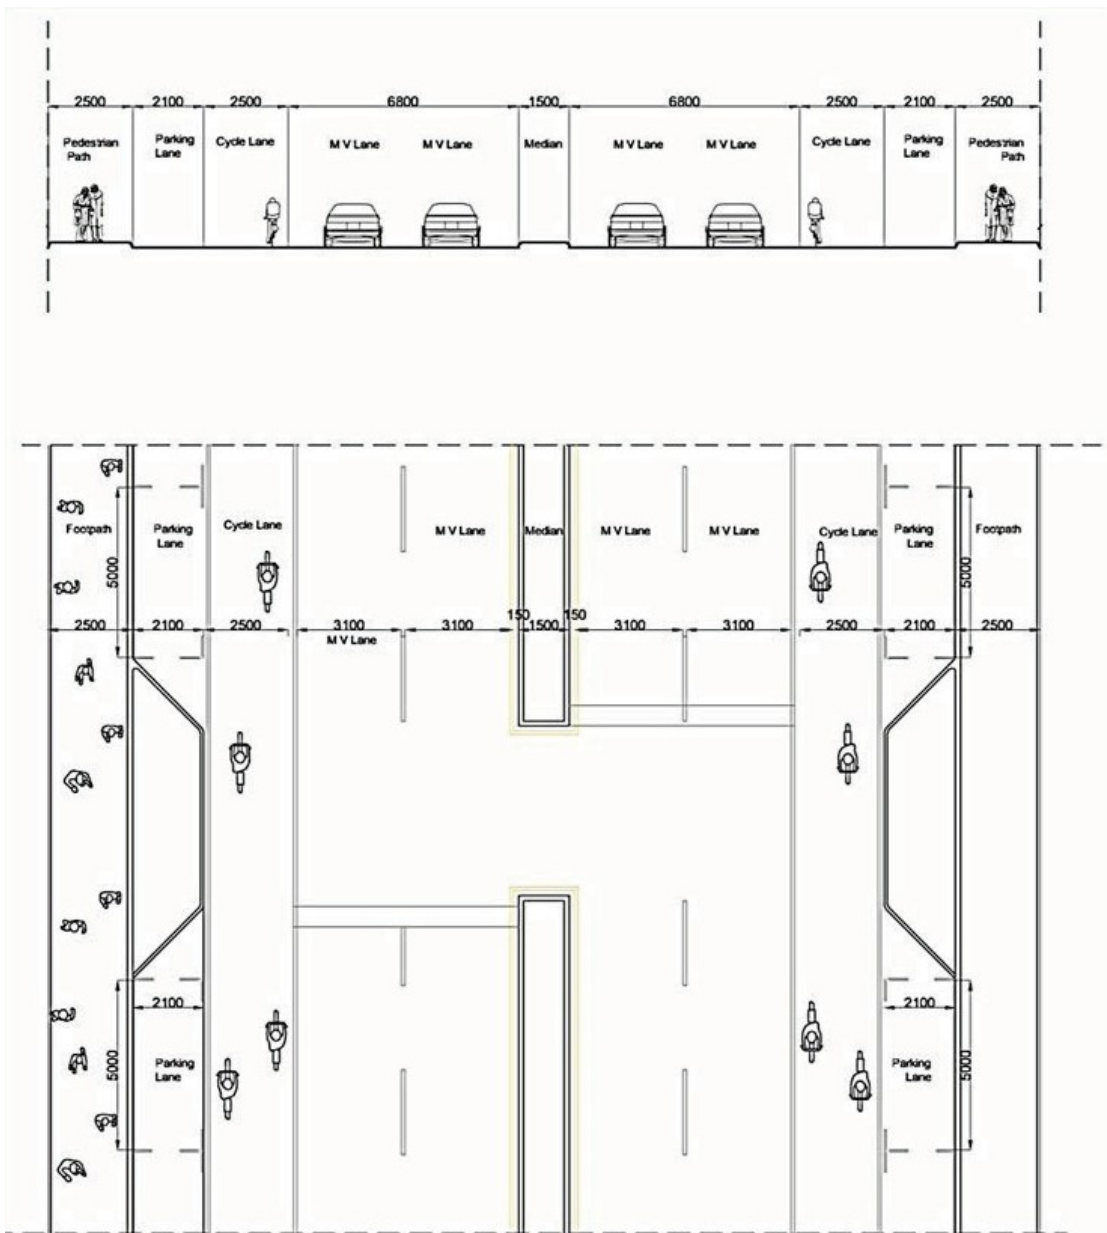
Plan and Section –Distributary Road with parking lane (design speed 30km/hr.)
